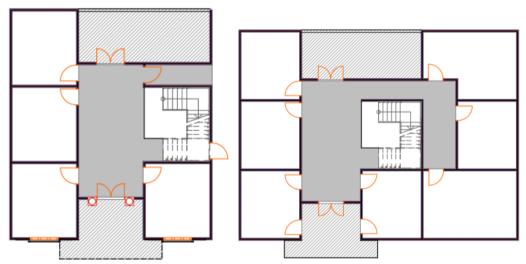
Amended plans of Dr.Fazil Küçük ground and first floor (Author, 2016)
